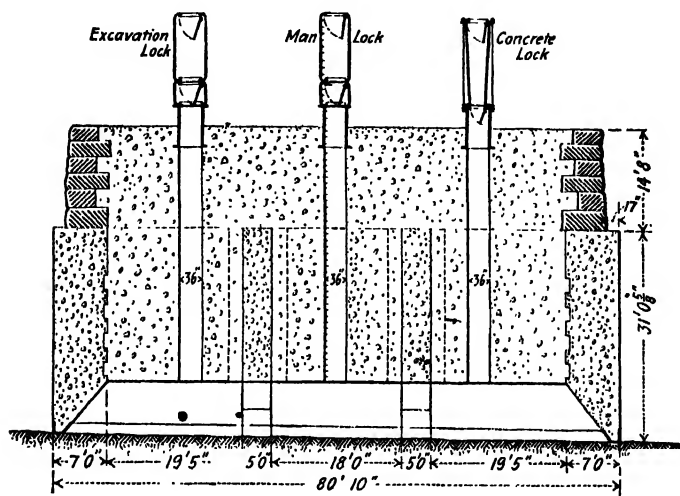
Caisson for Pittsburgh and Lake Erie Railroad Bridge, Beaver, Pa.
